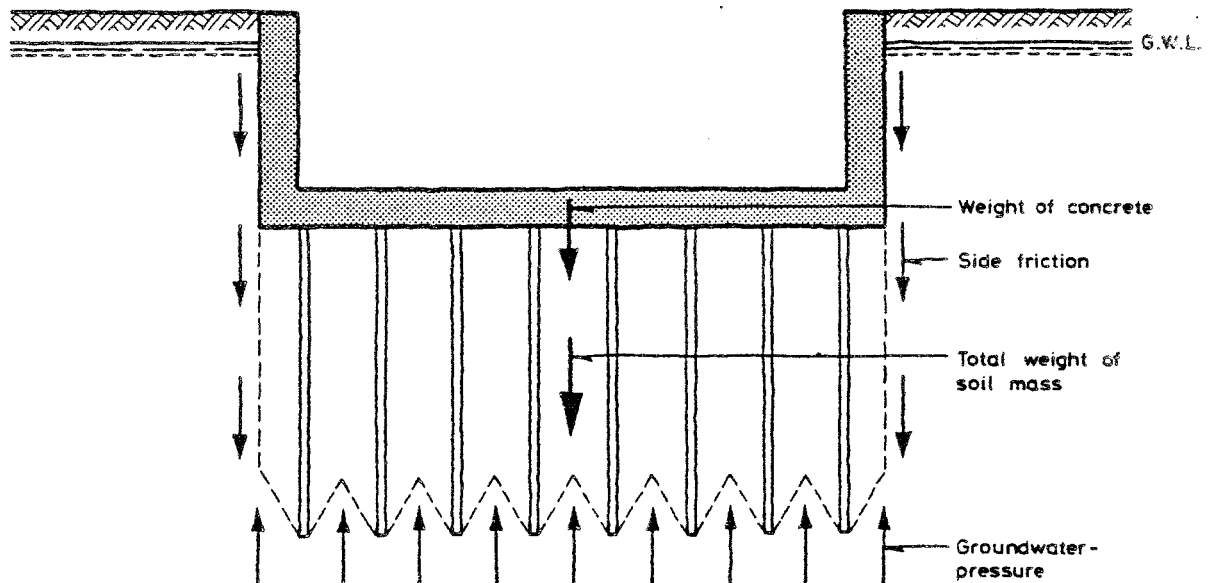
b. Forces Acting on Pile Foundation for Dry Dock
